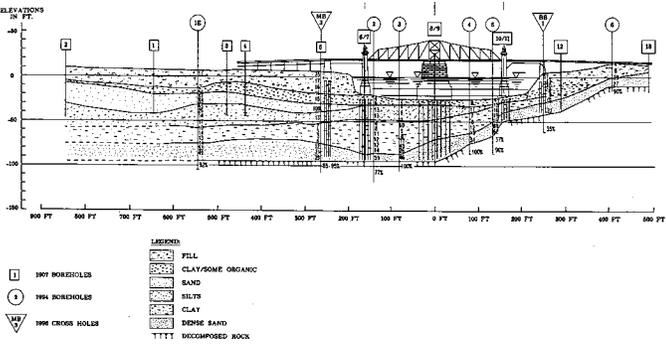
The soil profile and elevation of the Madison Avenue Bridge.
